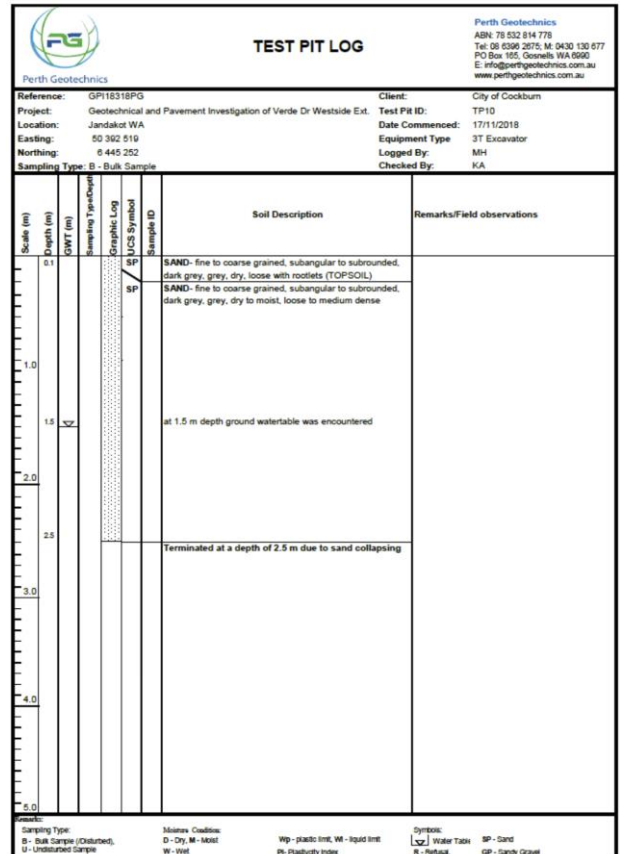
Test Pit Log (Verde Dr.) at Location TP10
